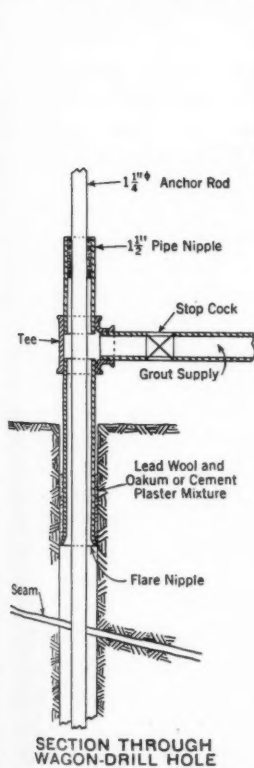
ARRANGEMENT FOR GROUTING SEAMS AND ANCHOR ROD SIMULTANEOUSLY
